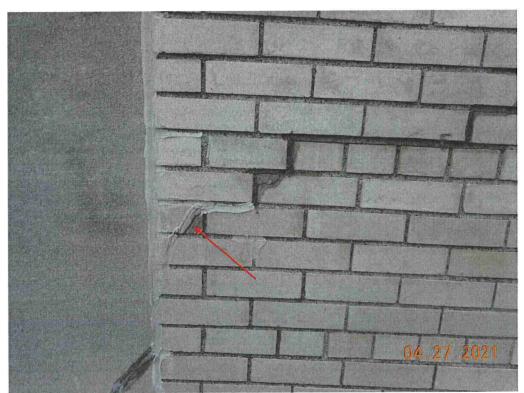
Cracks through the brick need to be ground out to 3/16" x 3/16" minimum and then caulked.
